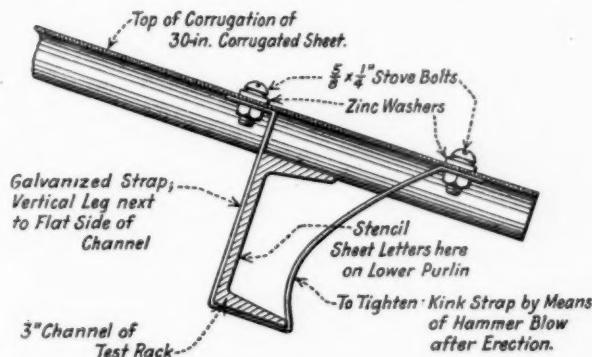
Detail Showing Method of Attachment of Corrugated Sheets to Rack.
